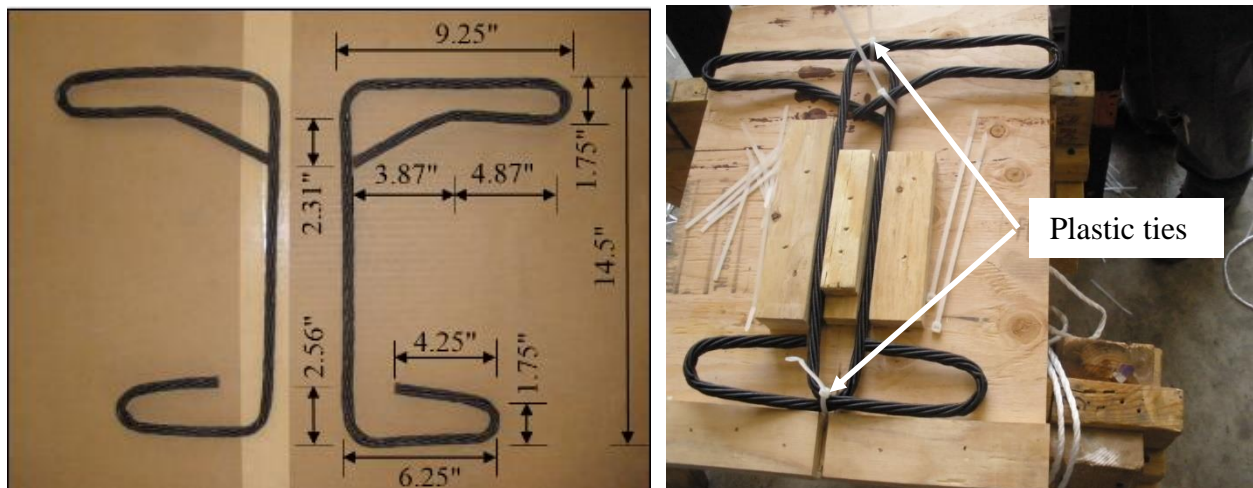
CFCC stirrups for Beam C-C-S-B
